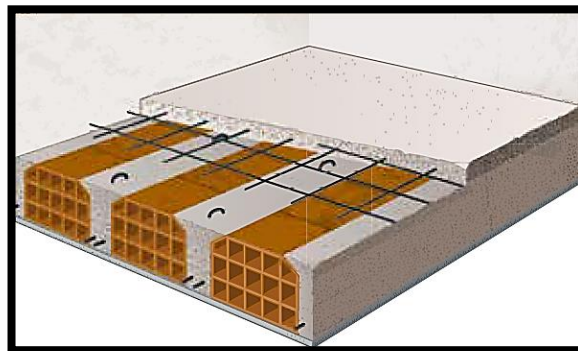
Prefabricated panels floor slabs. (Source: Leca)
